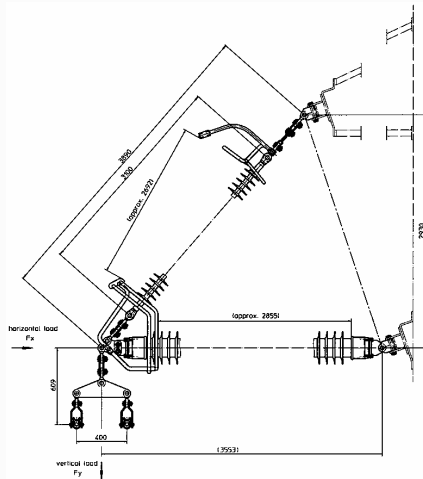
Installed Hollow Core Design -Arrangement 1
